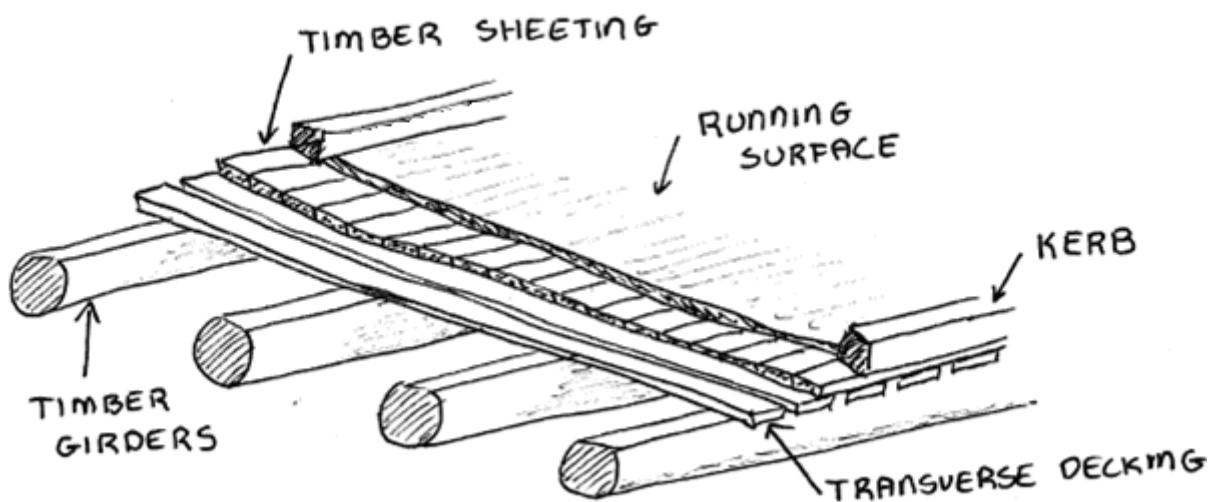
Sketch of Typical Elements of Timber Beam Bridge
